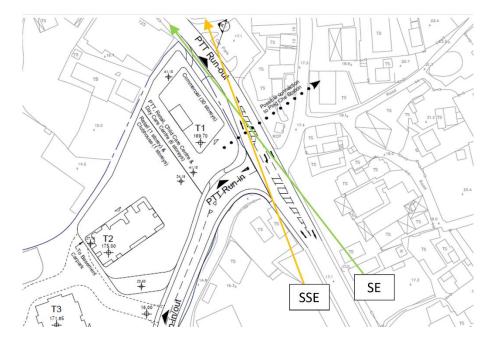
Layout of Building Setback with SE and SSE Wind Air Path
